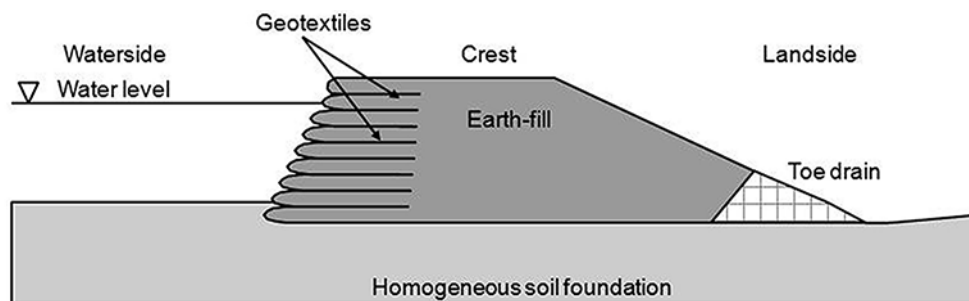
Composite levee with geotextile retaining wall on homogeneous soil foundation
